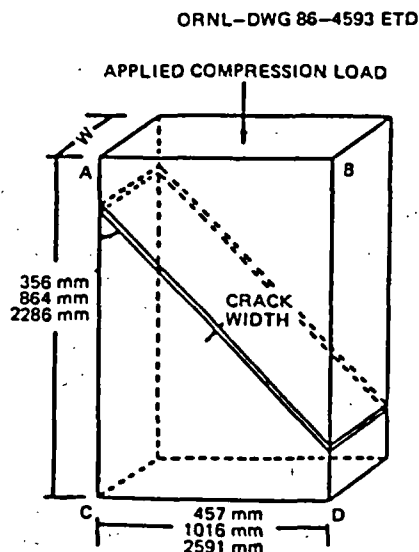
General configuration of small-scale epoxy-repaired shear wall specimens. Source: J. M. Plecnik et al., "Epoxy-Repaired Concrete Walls Under Fire Exposure," *ASCE J. Str. Div.* 108(STP8) (August 1982).
